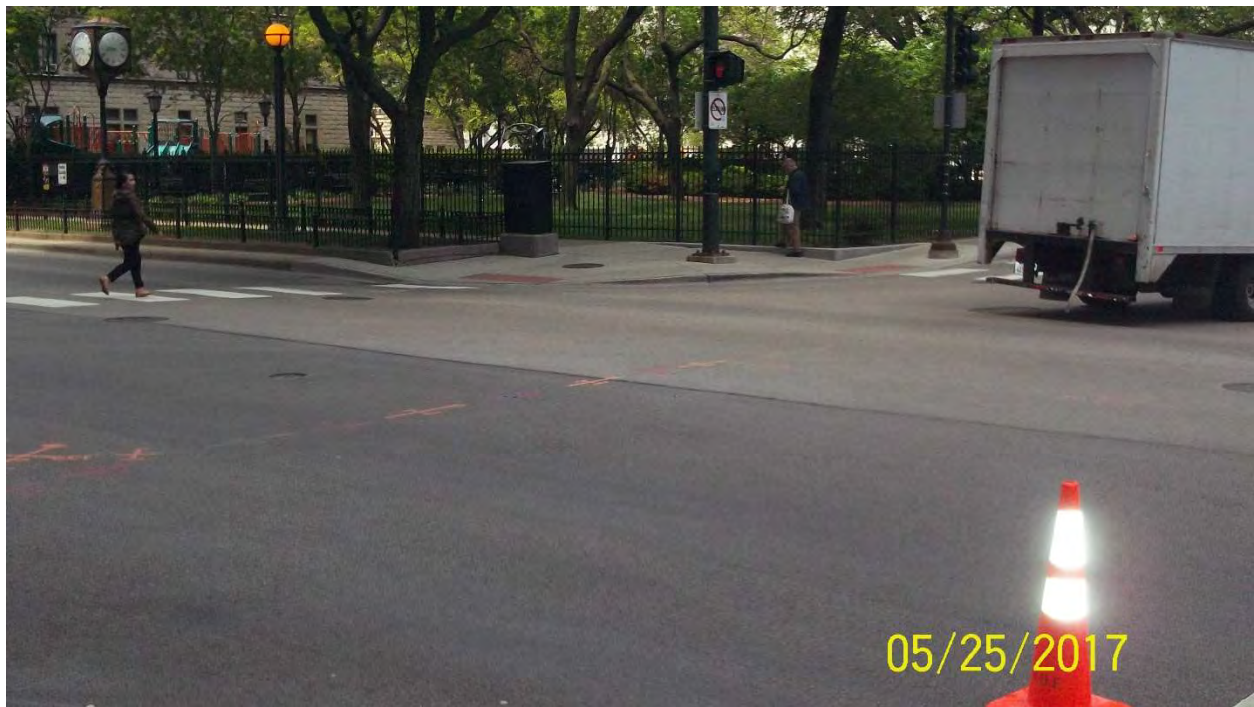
Southeast corner of Chicago Ave. / Mies van der Rohe – Looking Northwest
